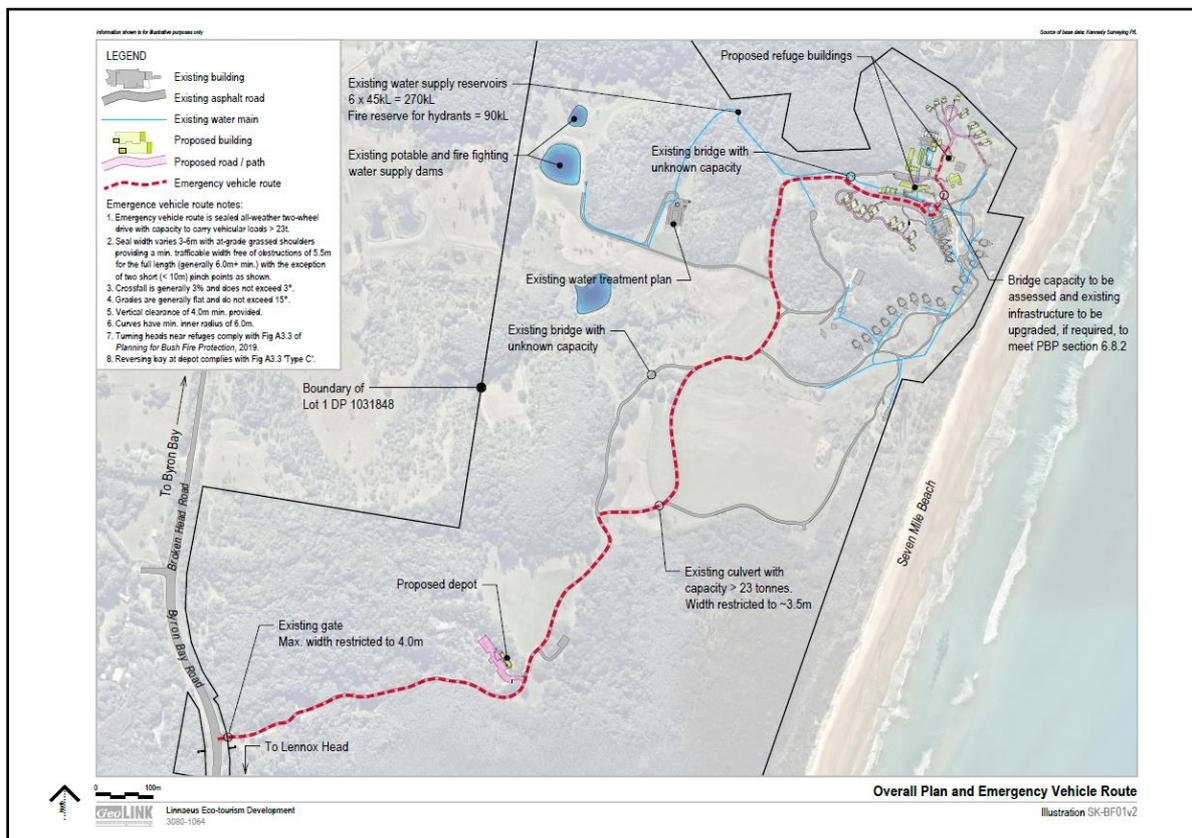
Fire-fighting appliance access route to the proposed safe refuge buildings.
